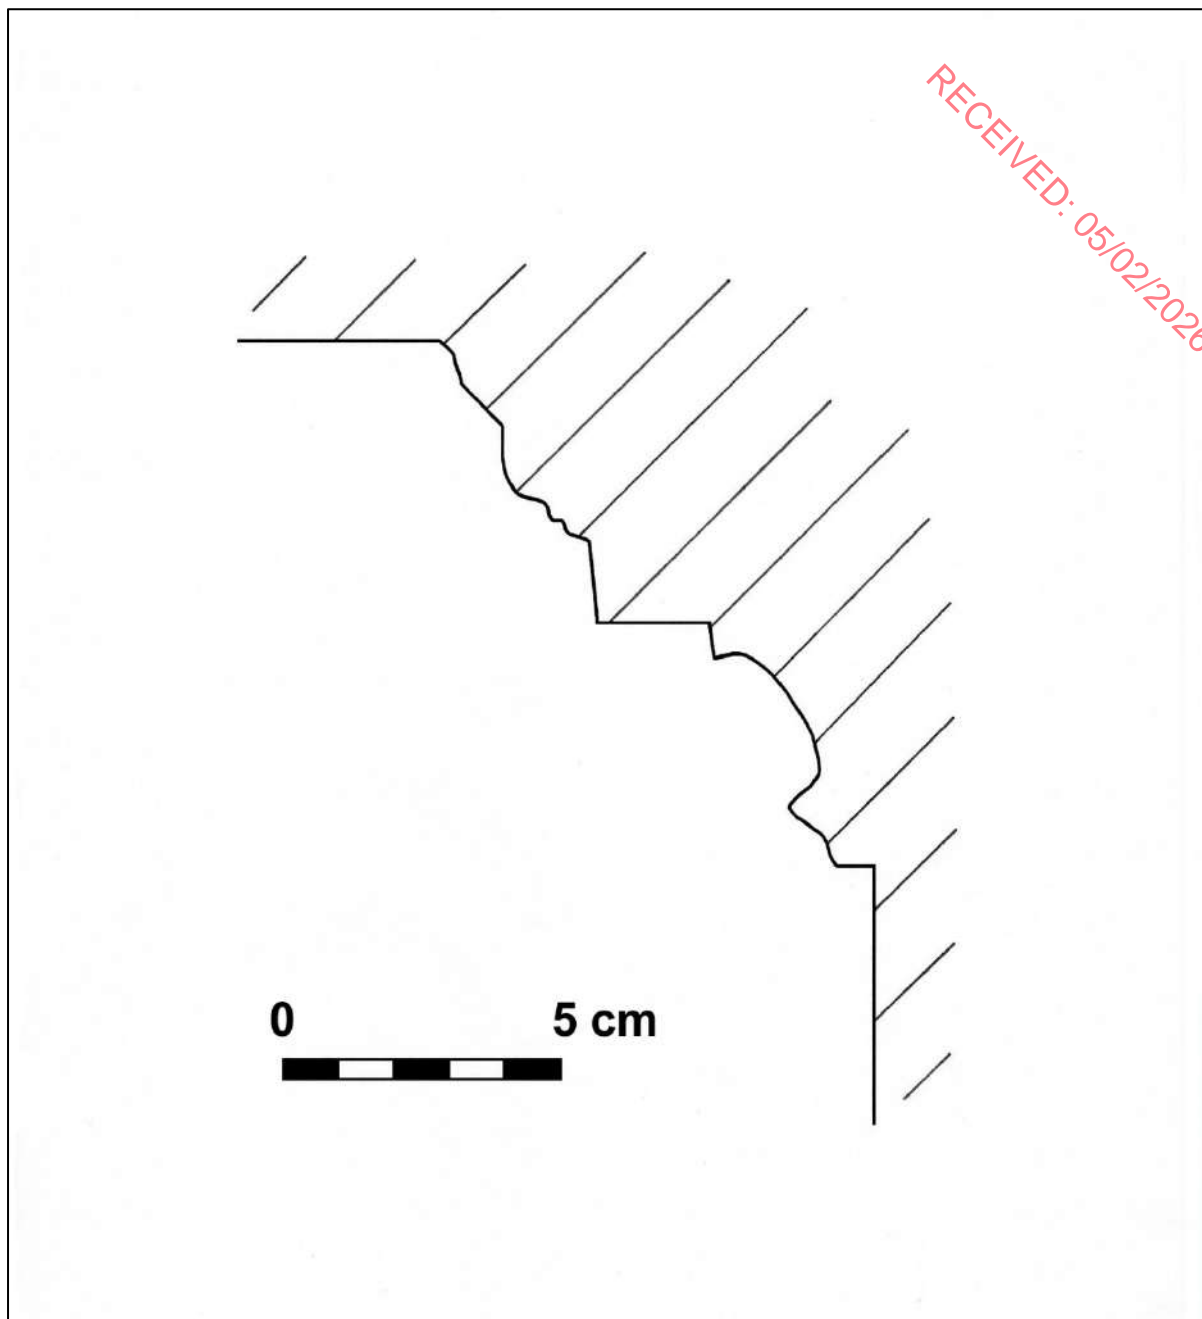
Section through coving moulding, eastern wall of entrance lobby.
